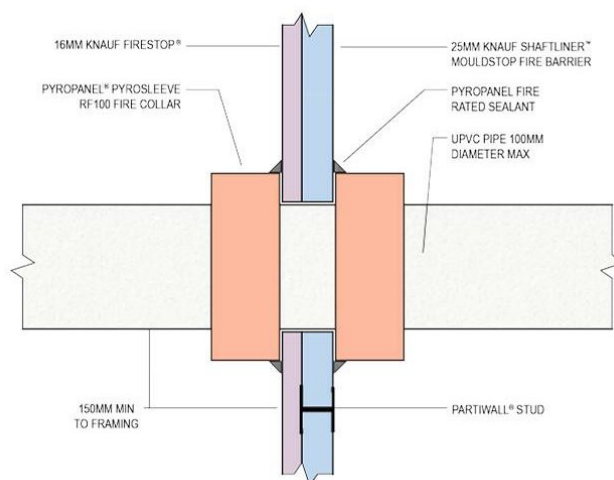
Back to Back Wall Penetrations – Plan Details – FRL 60/60/60
